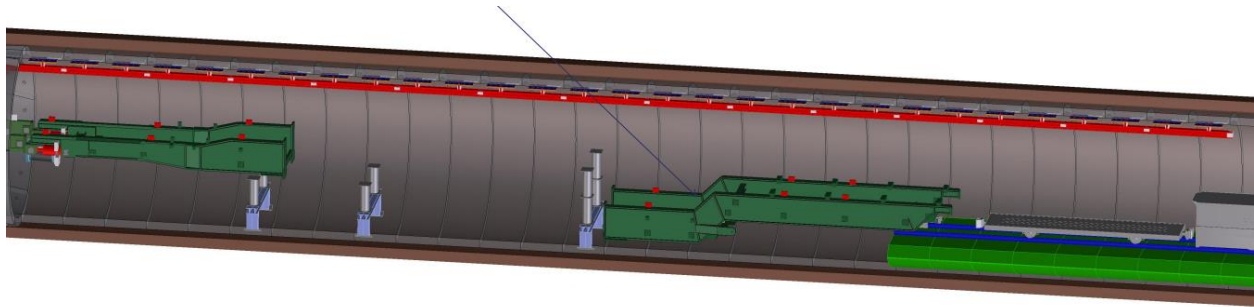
Bridge 1 dismantling ("HK 5102-091-001-01 Shield Disassembly", Herrenknecht, 2022)
